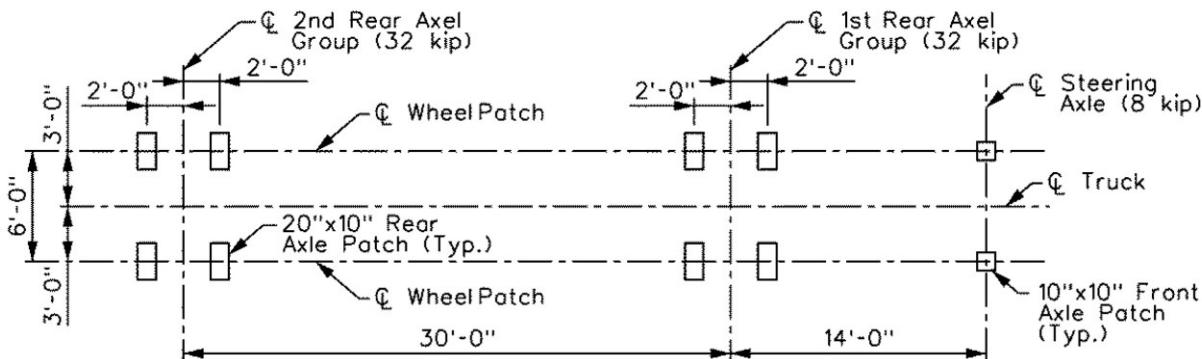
Refined Design Truck Footprint for Fatigue Design of Orthotropic Decks
